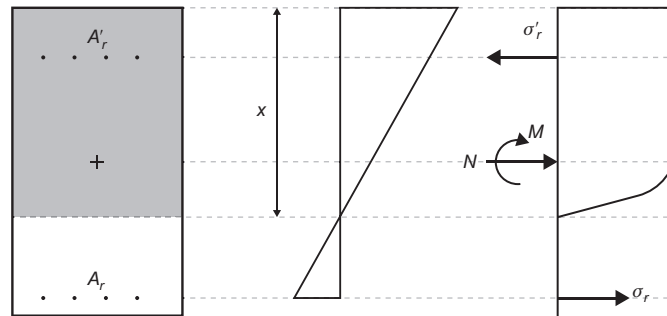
Equilibrium of a reinforced concrete cross section.
